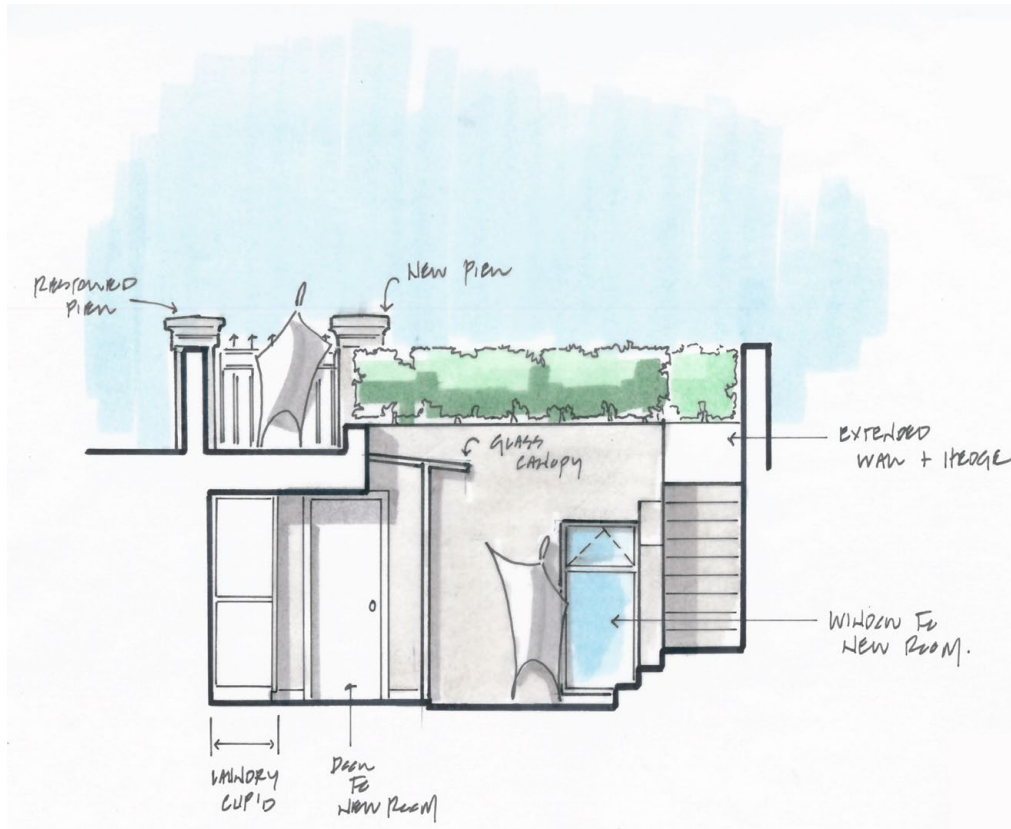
Concept image of the proposed extension (section through the front area looking towards Regent's Park Road)
